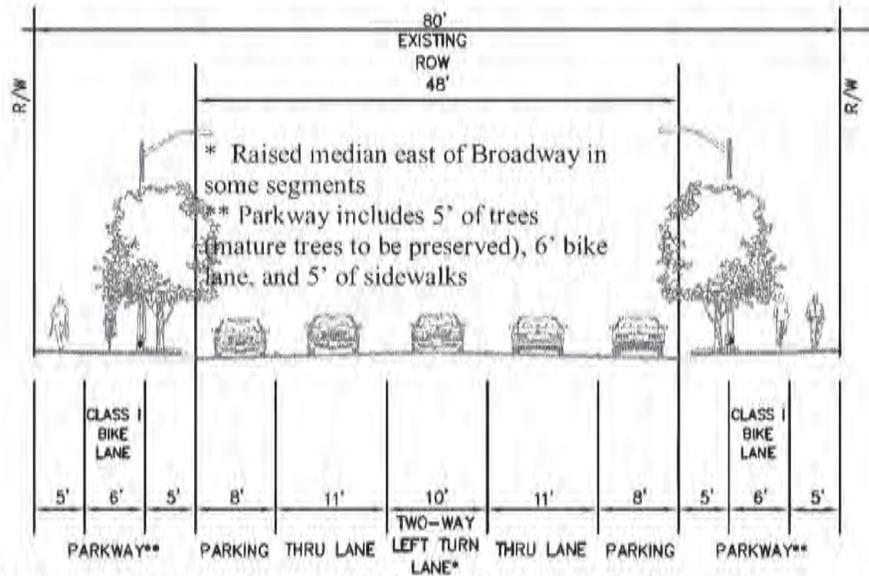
Proposed Cross Section, F Street Between Third Avenue and I-5
